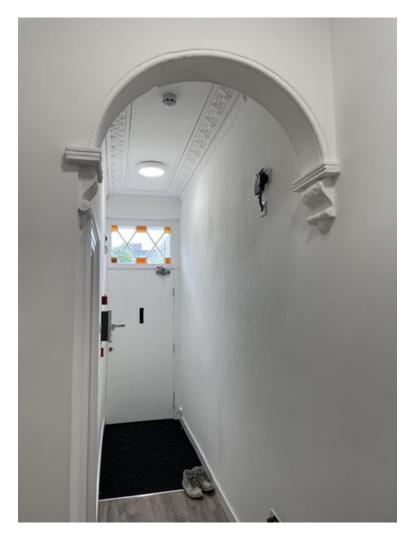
Main entrance. Architectural detailing retained in the ground floor hallway.
